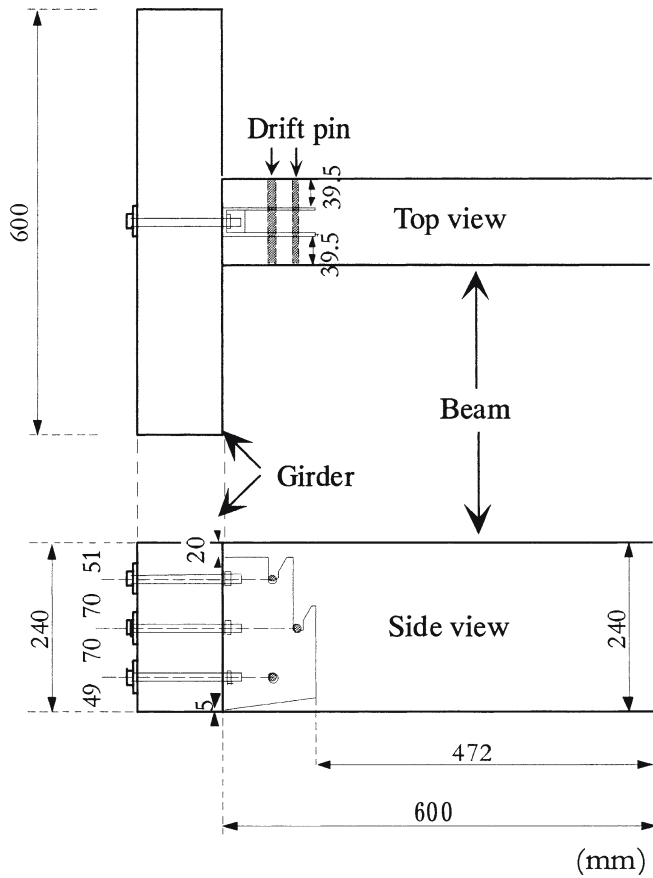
Girder-beam joint with GK21 connector (240mm beam depth)
